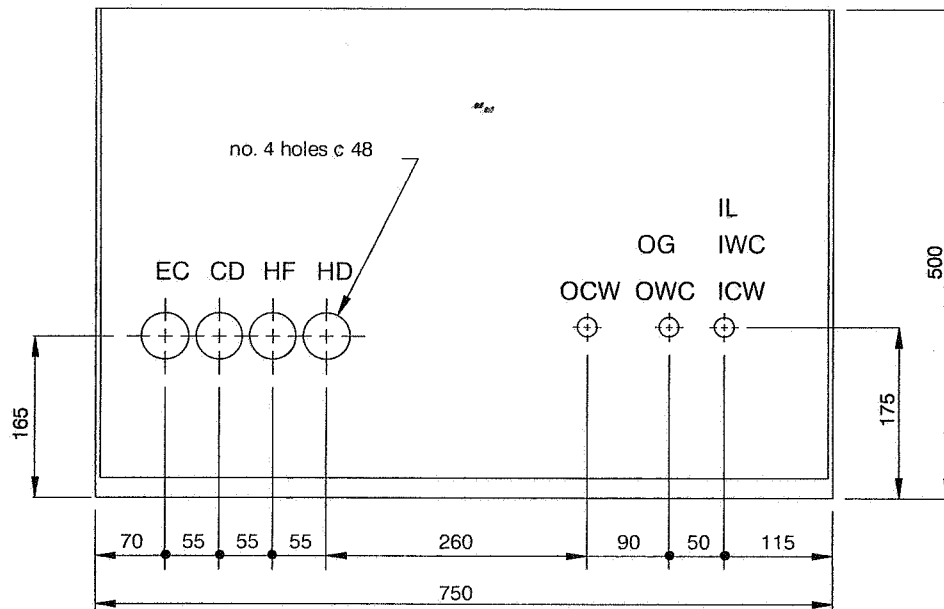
Refrigerant, water and electrical connections Himod S 04 ÷ 06 – Plant view
